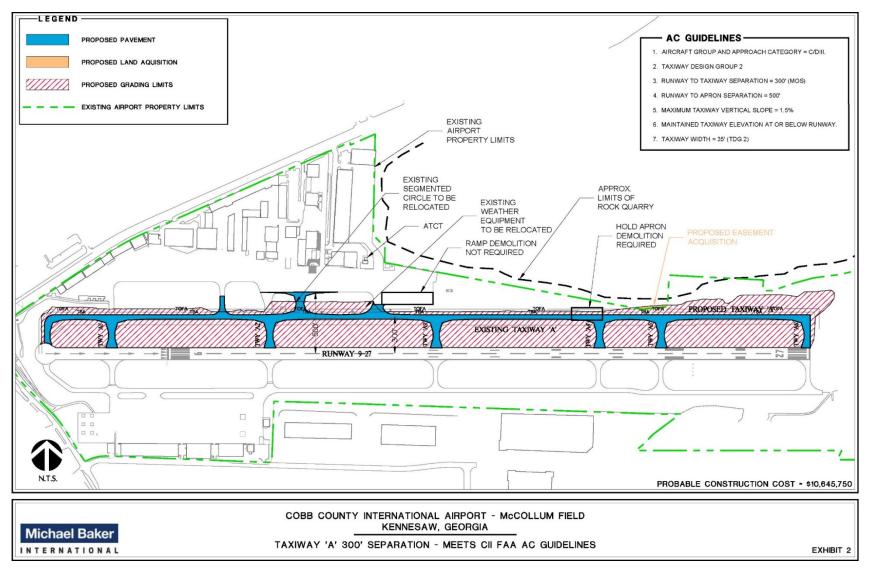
Taxiway 'A' Relocation, Alternative 1e (300-foot Runway/Taxiway Separation)
